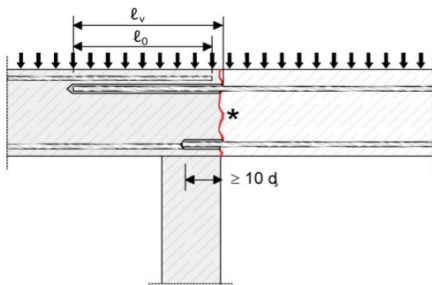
End anchoring of slabs or beams, designed as simply supported.
